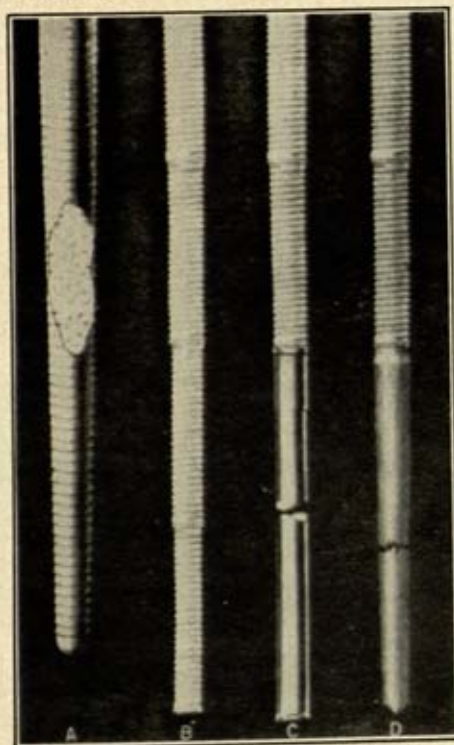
Raymond cast-in-place concrete piles: (A) standard pile; (B) step-taper pile; (C) pipe step-taper pile; (D) composite pile. (Raymond Concrete Pile Co.)
